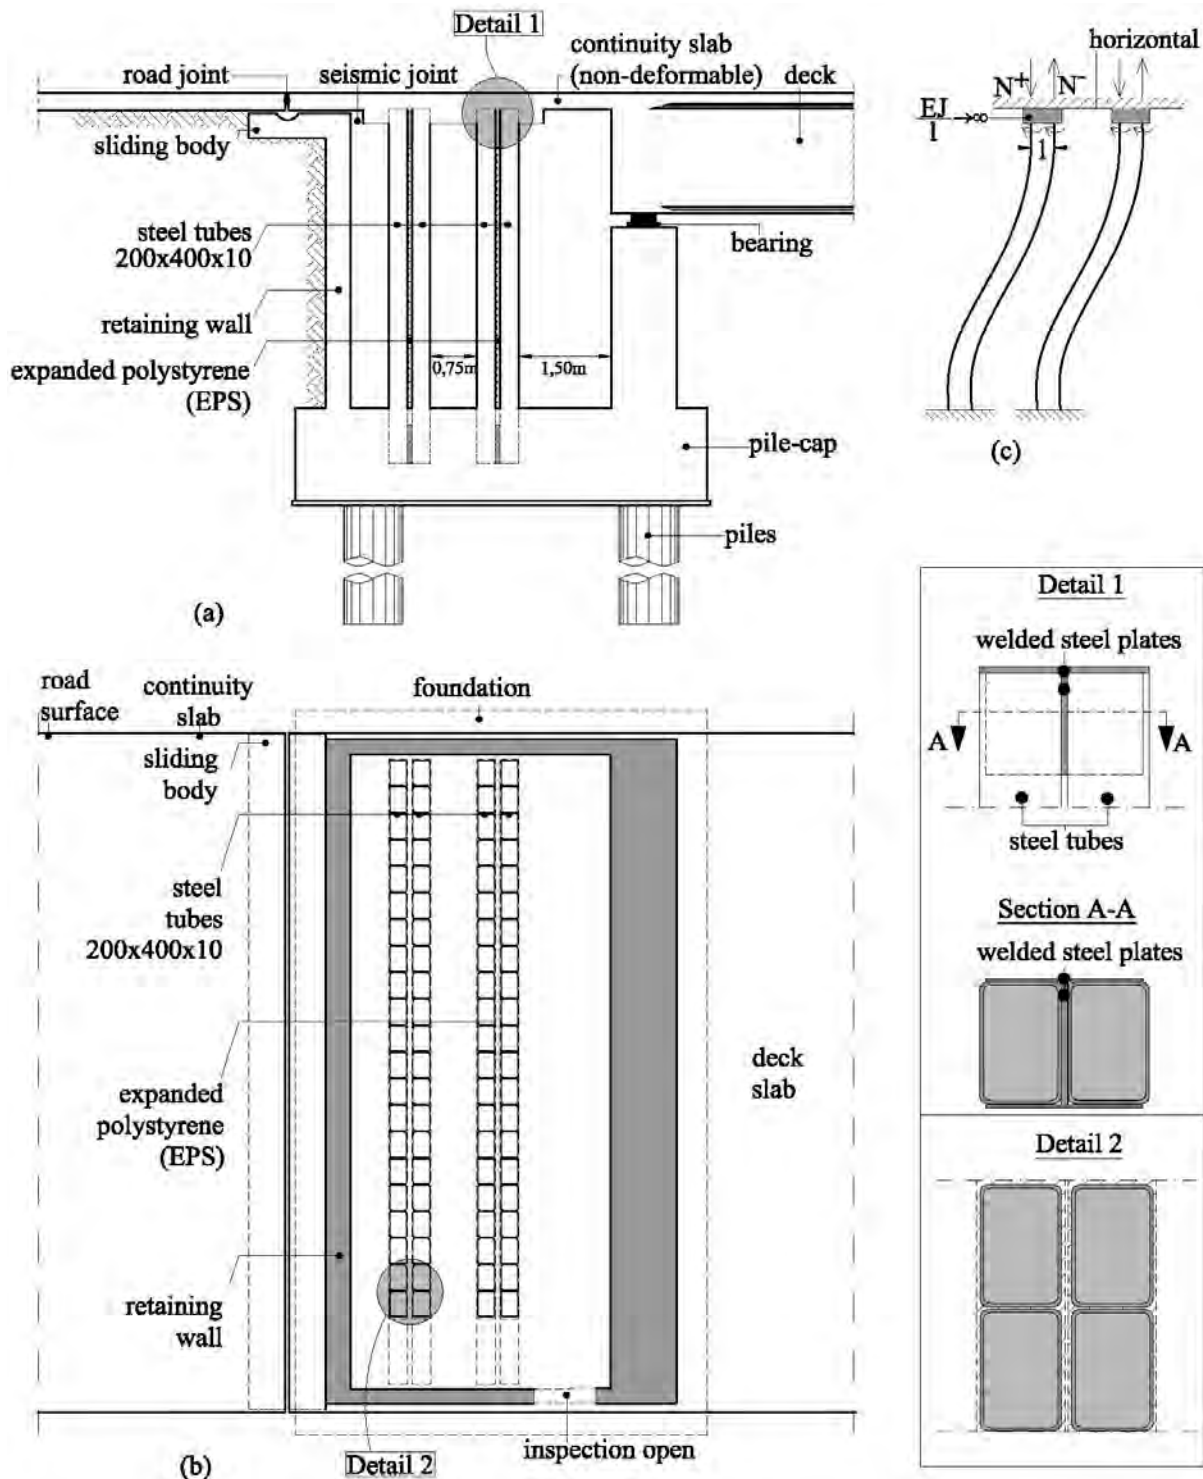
(a) Longitudinal section of the proposed restraining system, (b) Plan view of the proposed restraining system and (c) Restraining members' model.
